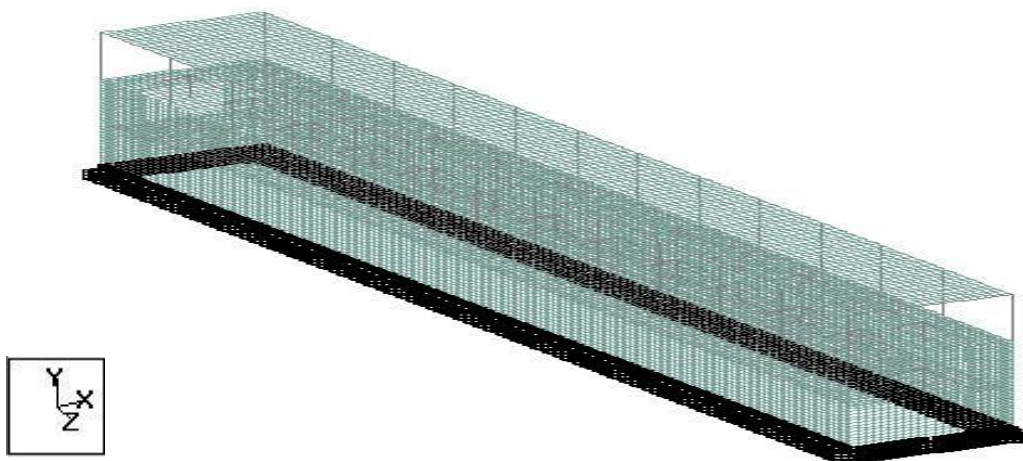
3D View of a Building Structure Model for Looms Industry in STAAD.Pro
